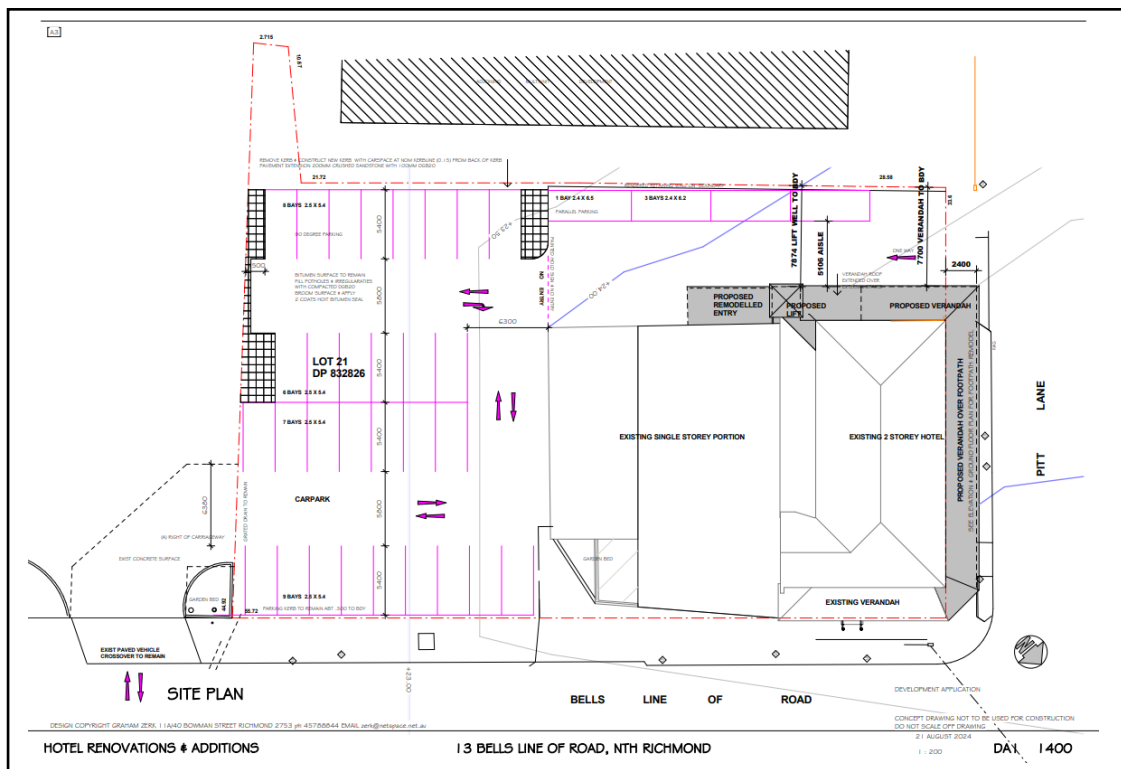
Site Plan (Source: Graham Zerk, 21 August 2024).
